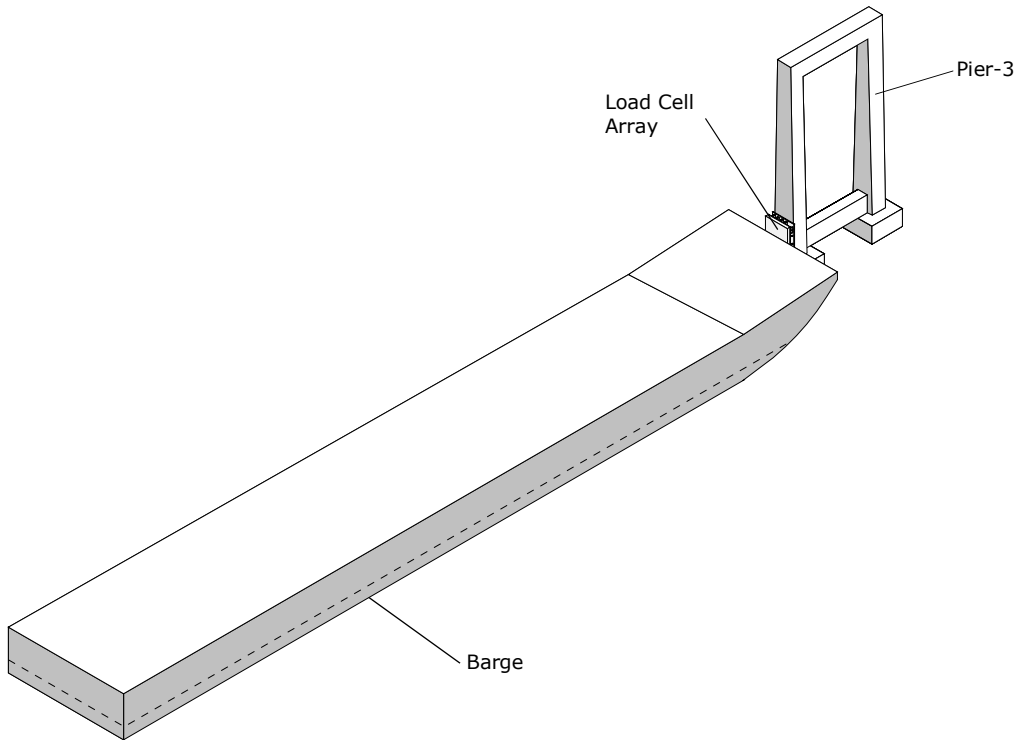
Pier-3, Barge and Load Cell Array for Pier-3
